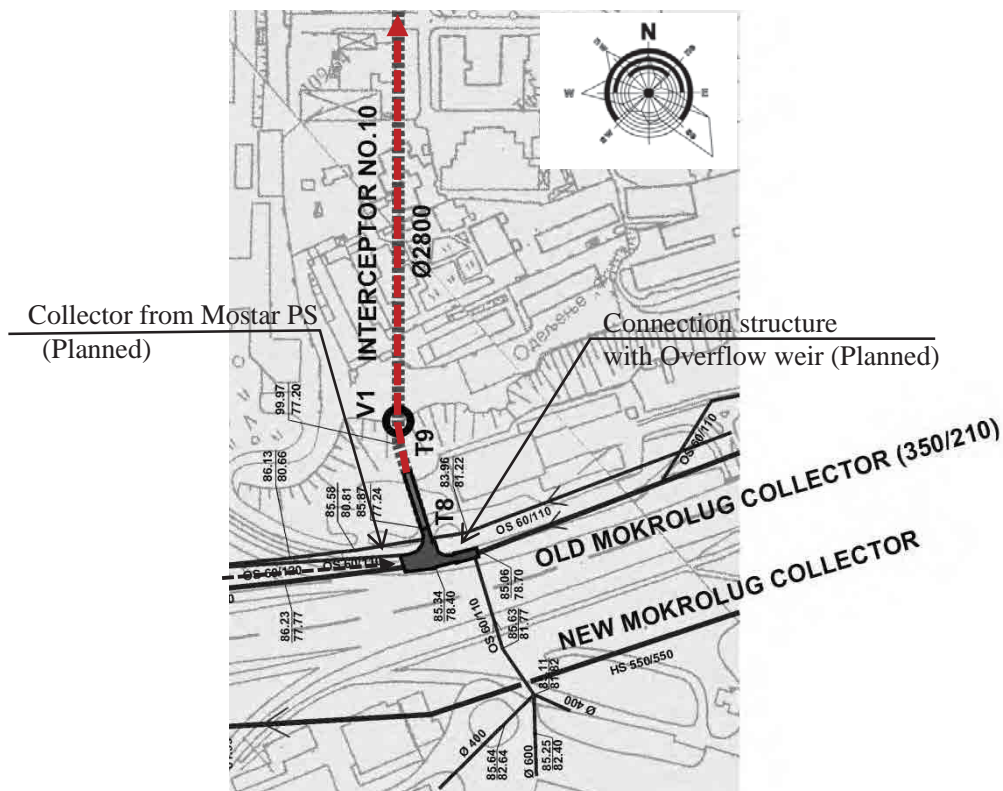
Layout Plan of the Connecting Structure at the Beginning of Interceptor No. 10
